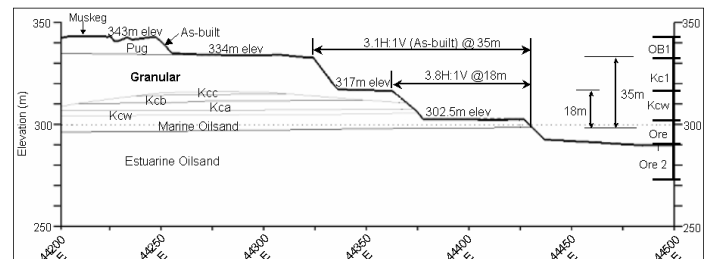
Non-Failed Slope Geometry North of G-Pit Triple Bench Failure
